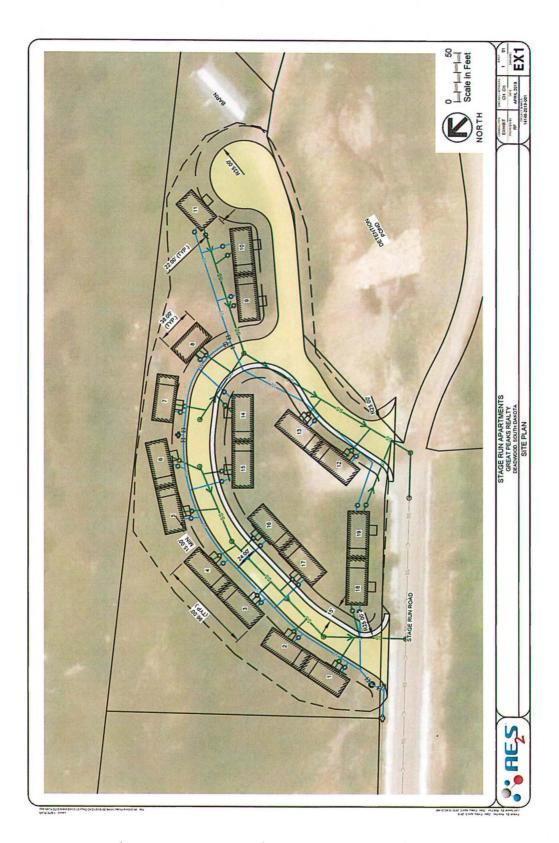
Stage Run Apartment Site Plan and Improvements
